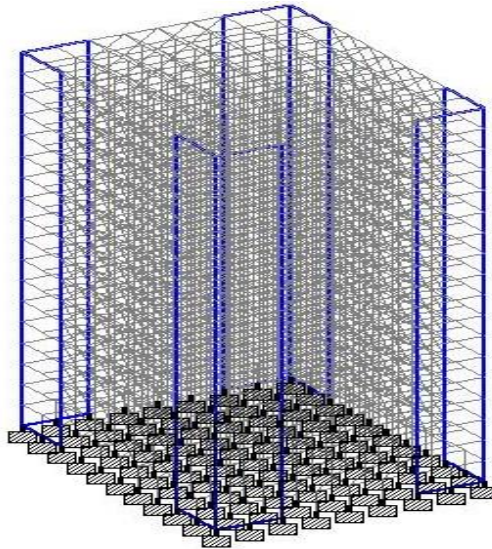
Isometric view Diagram of Rectangular Building with Shear wall using R.C.C shear wall
